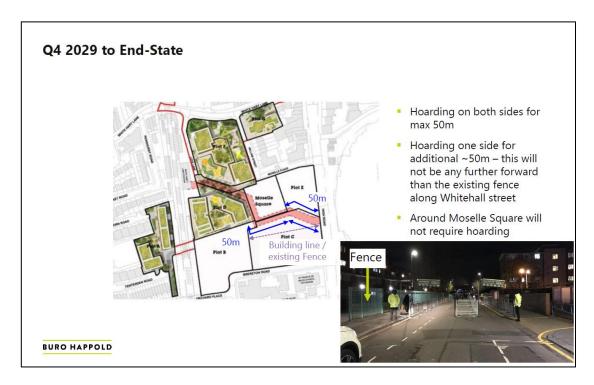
HRW Masterplan Construction Phasing - Indicative Hoarding Plan (2029 to End)
